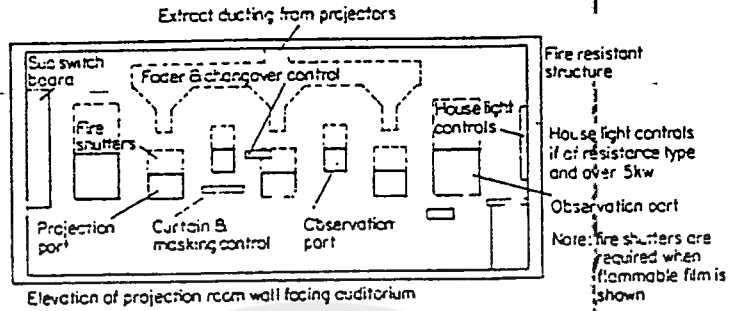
Typical arrangement of control rooms and lighting galleries
